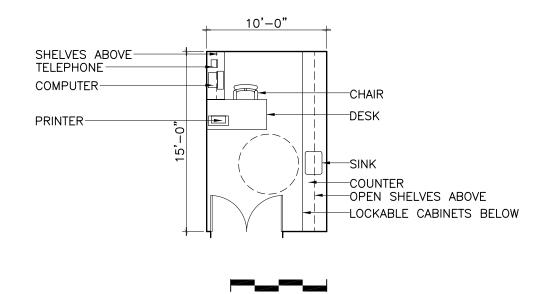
Housing Maintenance Building Staff Break Room Diagram
